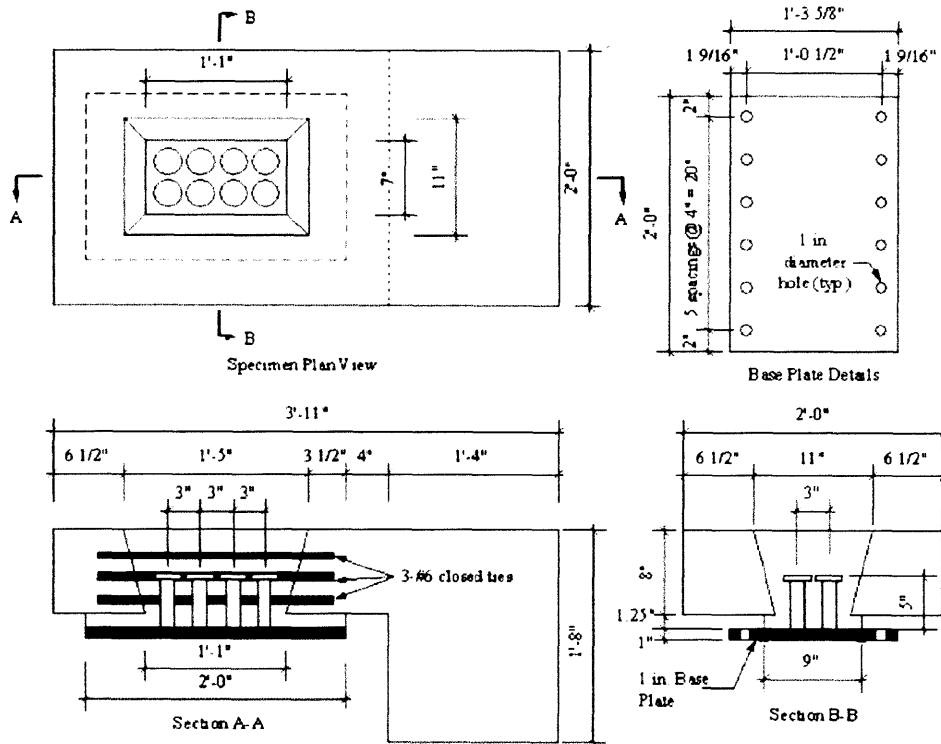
Concrete dimensions of the eight-stud closed-tie confinement specimen
